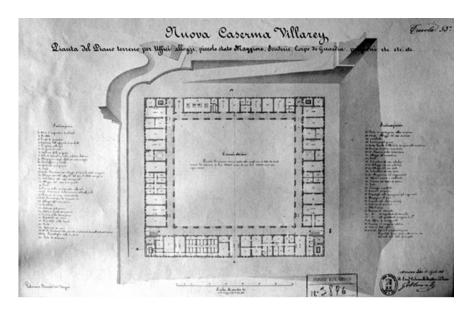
Bernardini (1868). "Nuova Caserma Villarey. Tavola 33ª. Pianta del Piano terreno per Uffici, alloggi, piccolo stato Maggiore, Scuderie, Corpo di Guardia, prigioni etc. etc. etc. Scala 1:400". (New Villarey Barracks. Plate 33. Ground Floor Plan with Offices, Lodgings, small General Staff, Stables, Guardhouse, prisons, etc., etc., etc. Scale 1:400). Historic Archives of the Istituto di Cultura dell'Arma del Genio di Roma (ISCAG)
